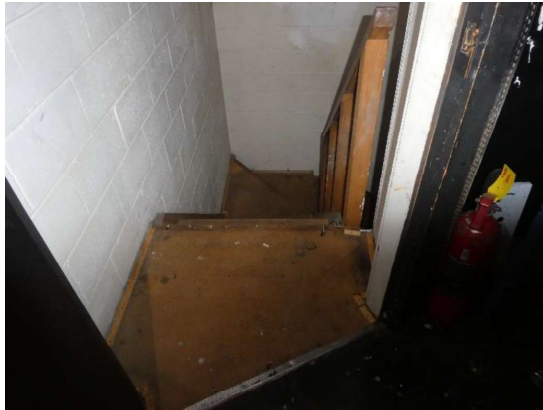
Showing the open tread stairs to the south western stairwell.
